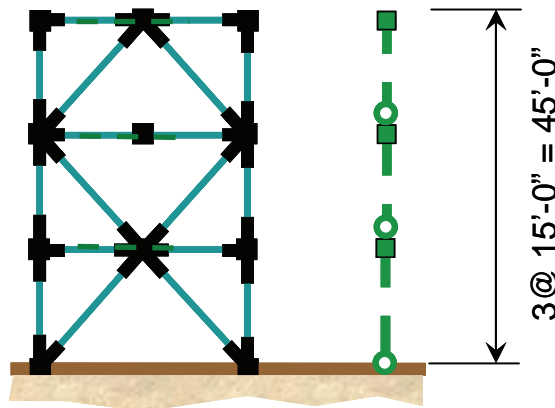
Two-dimensional plane frame model with a leaning column (3-story archetype shown).
